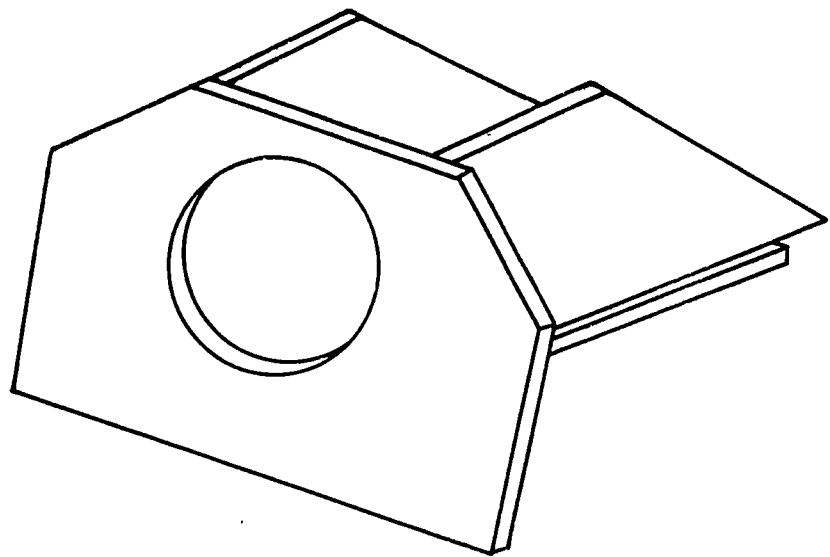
Precast Concrete Slab Installation for Panel Nakkas.
